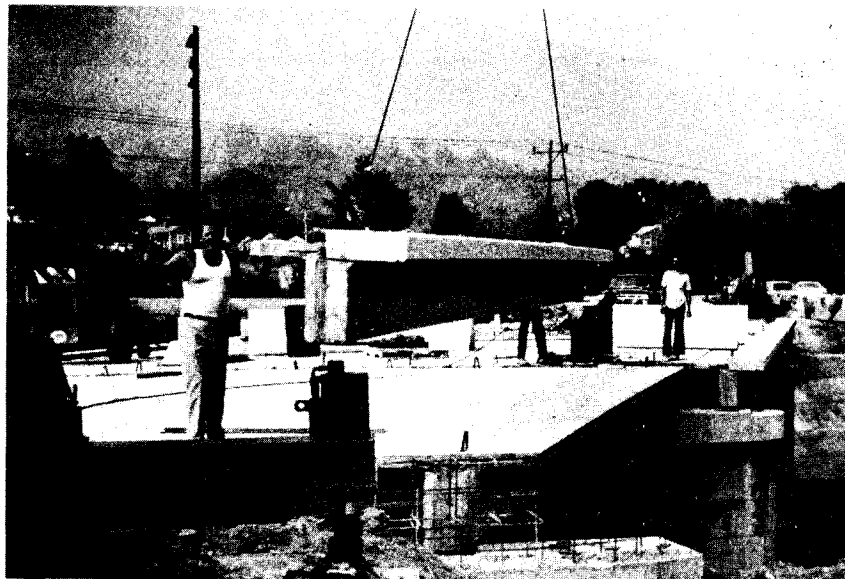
Exterior tee beam is placed into position on span C B604, Norton.
